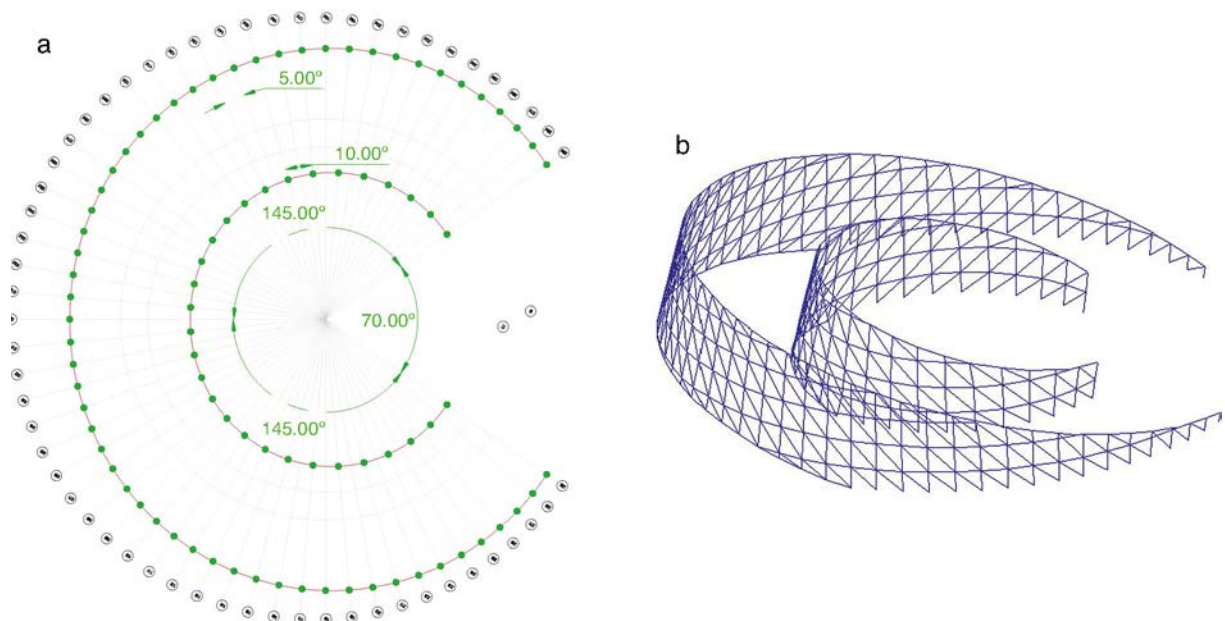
Basic geometry of the façade trusses: plan view (left) and three-dimensional modelling (right).
